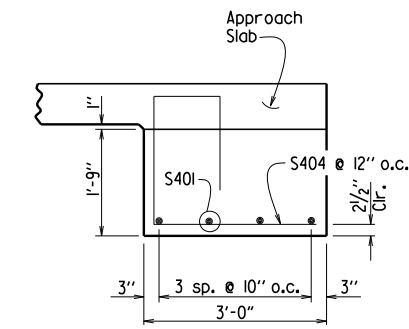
DETAILS OF LONGITUDINAL CONSTRUCTION JOINT
